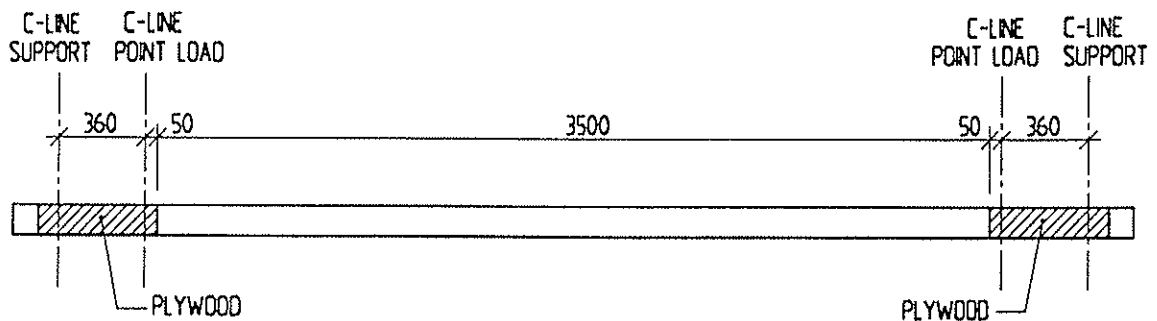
Test specimen reinforced with plywood. All sizes in mm.
